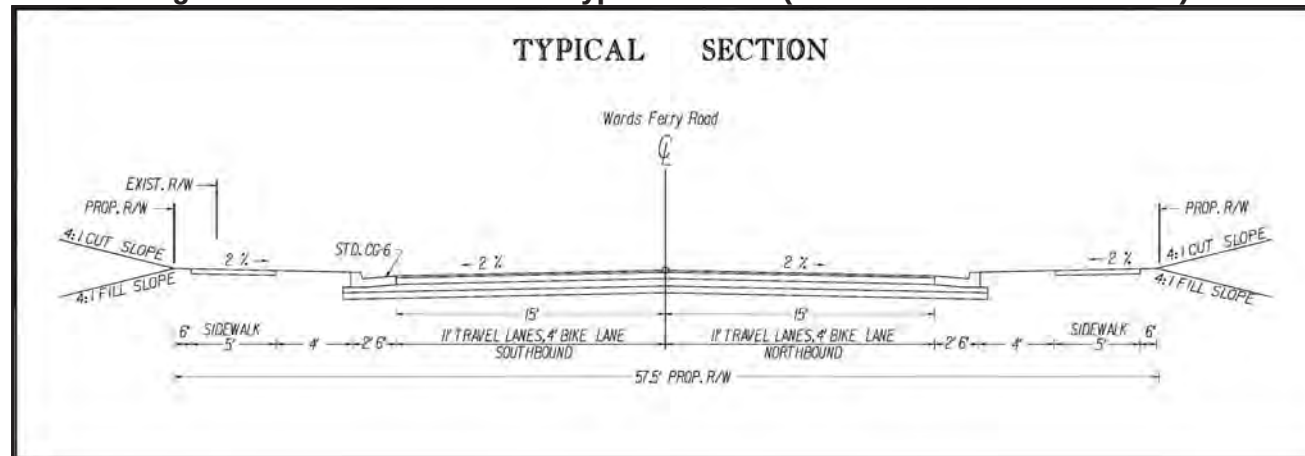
Bike Lane/Sidewalk Typical Section (Initial Preferred Alternative)
